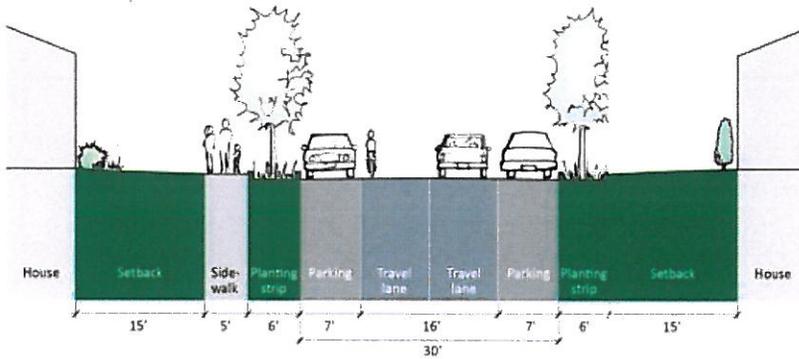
(B)-2: Cross-sections for local access street design options (with standard dimensions)
